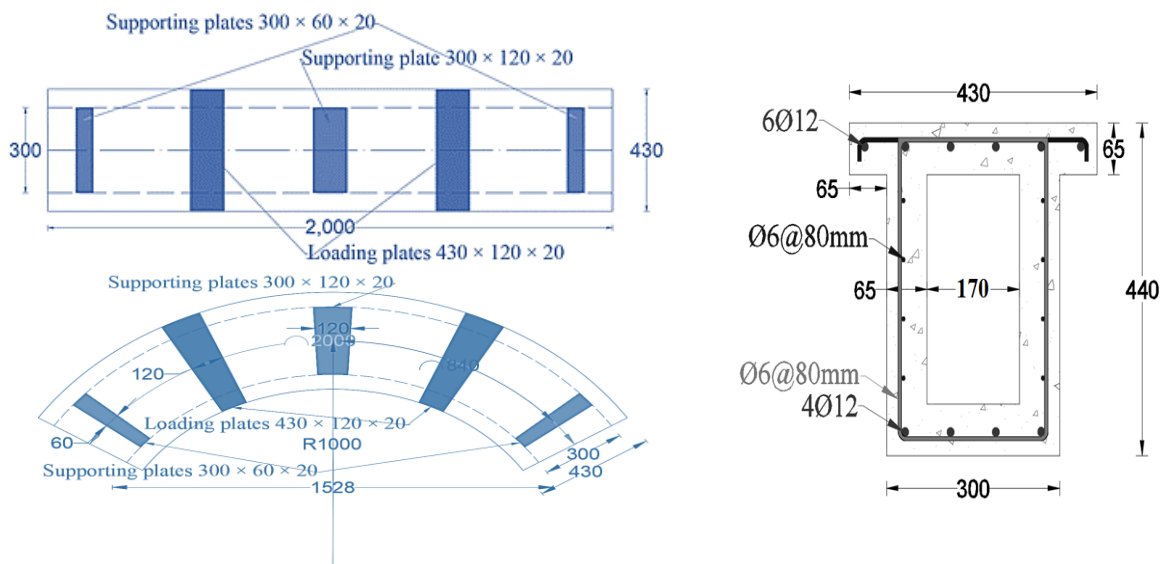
Longitudinal and cross-sectional dimensions of reference straight and curved deep box girders
